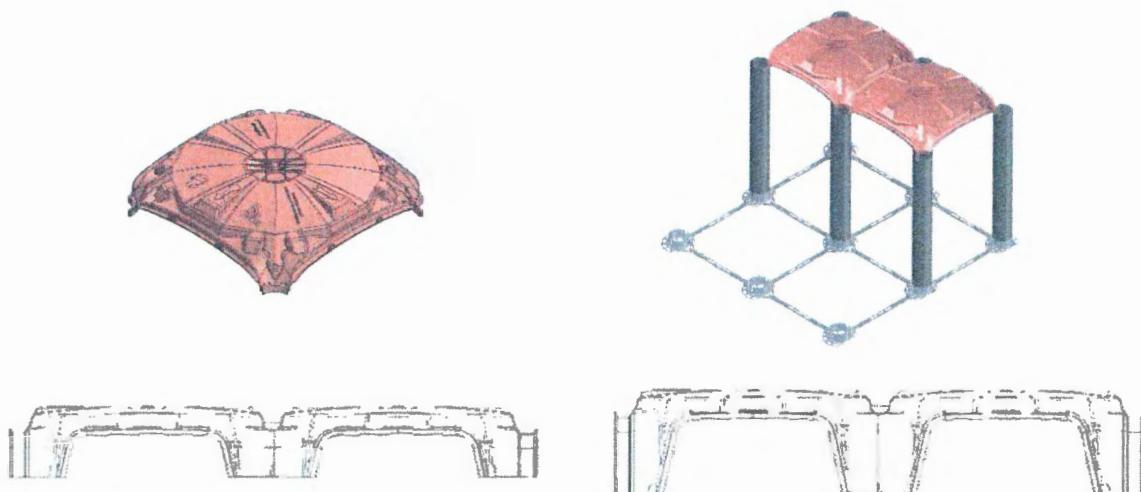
ABS plastic disposable formwork for reinforced concrete slab construction.
